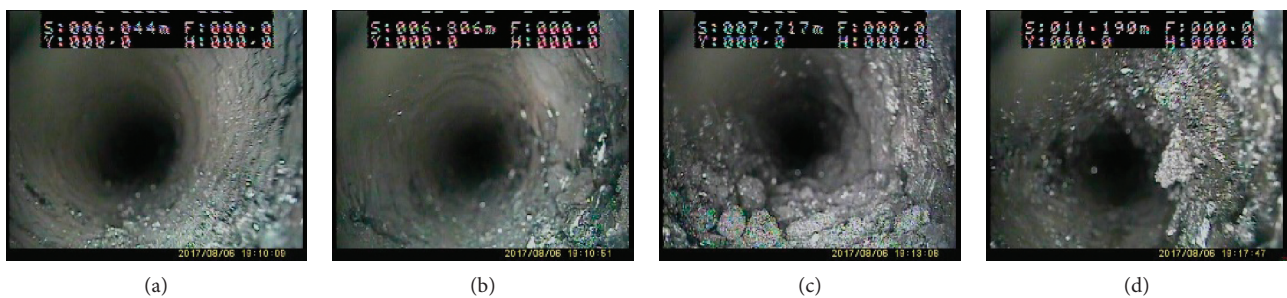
The distribution of the surrounding rock (2.3–7.8 m) outside the anchor zone. (a) 2.6 m. (b) 4.2 m. (c) 5.8 m. (d) 7.6 m.
